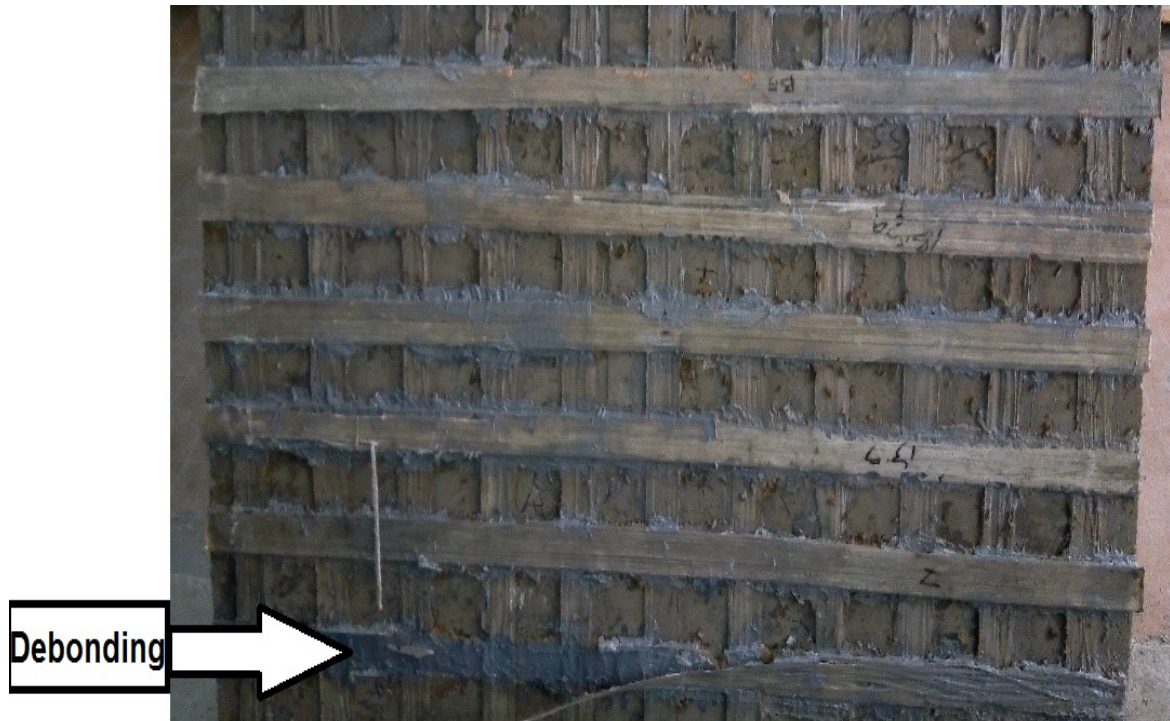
Debonding shape for specimen (GS-1.5-20-Ag).
